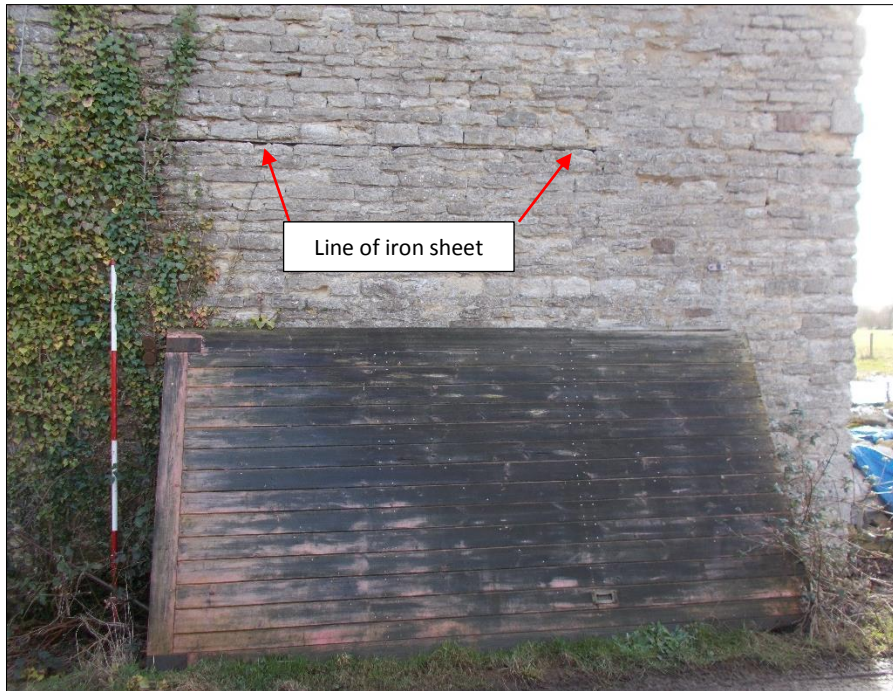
The detached sliding door against the west wall, looking east. 2m scale.
